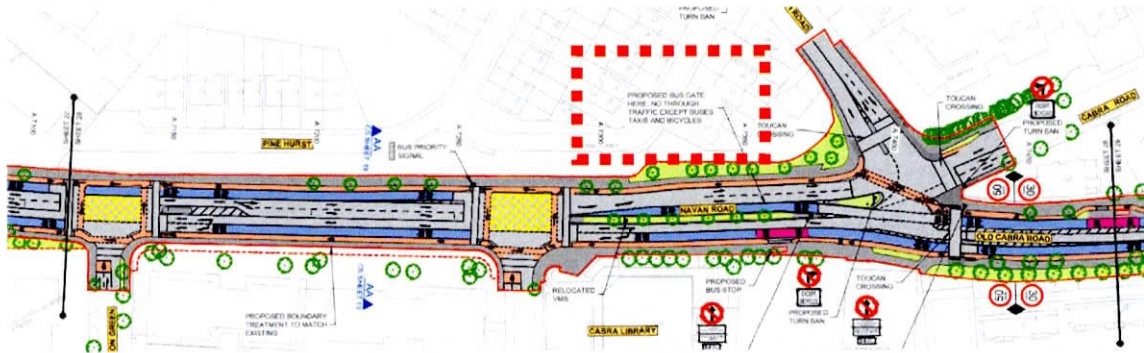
Extract from Sheet 28 of the General Arrangement drawing illustrating the proposed bus gate (red dashed line) at the junction of Navan Road, Cabra Road and Old Cabra Road.
